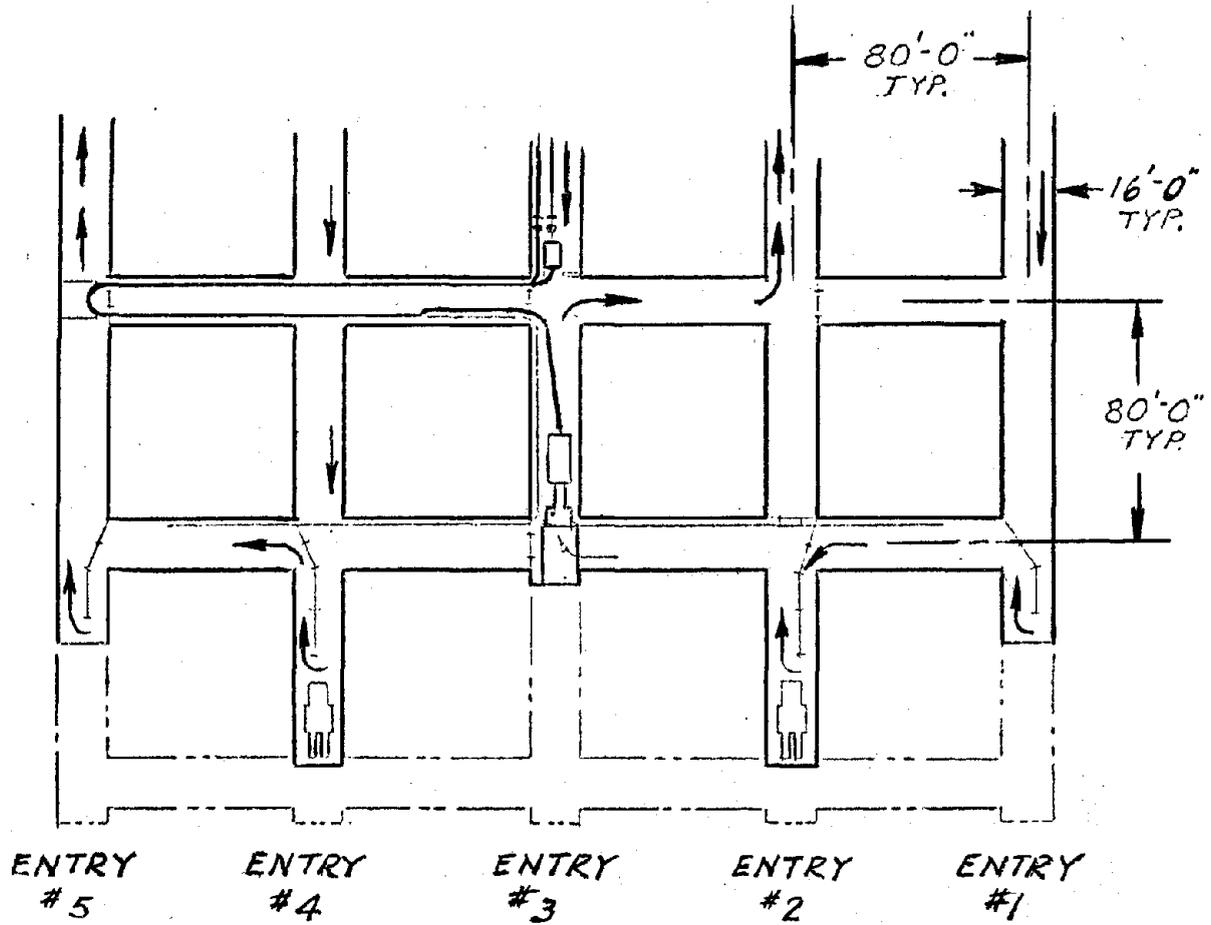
Mine Plan; First Cut in Entry No. 3
